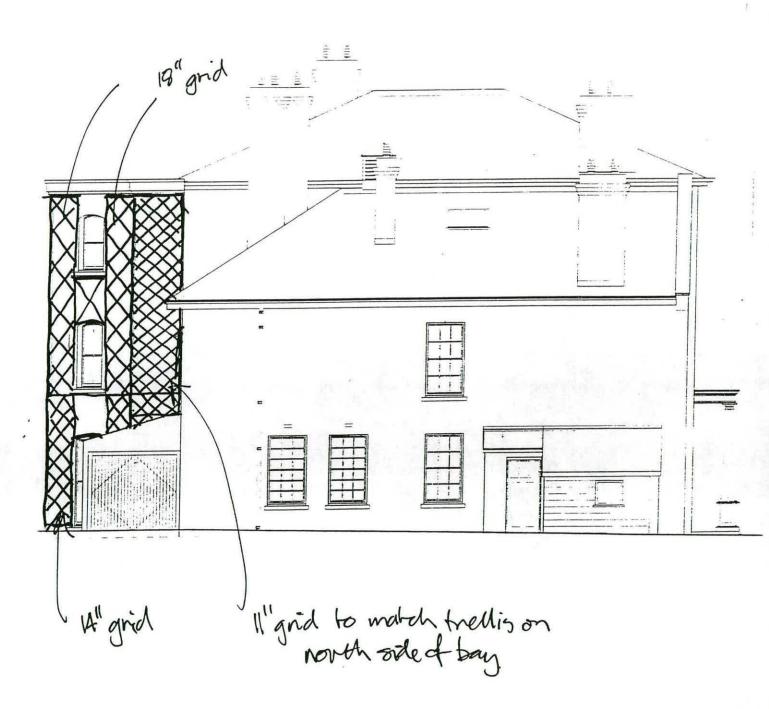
A sketch reconstruction drawing of the trellis on the east front at Down as it might have appeared c 1880
